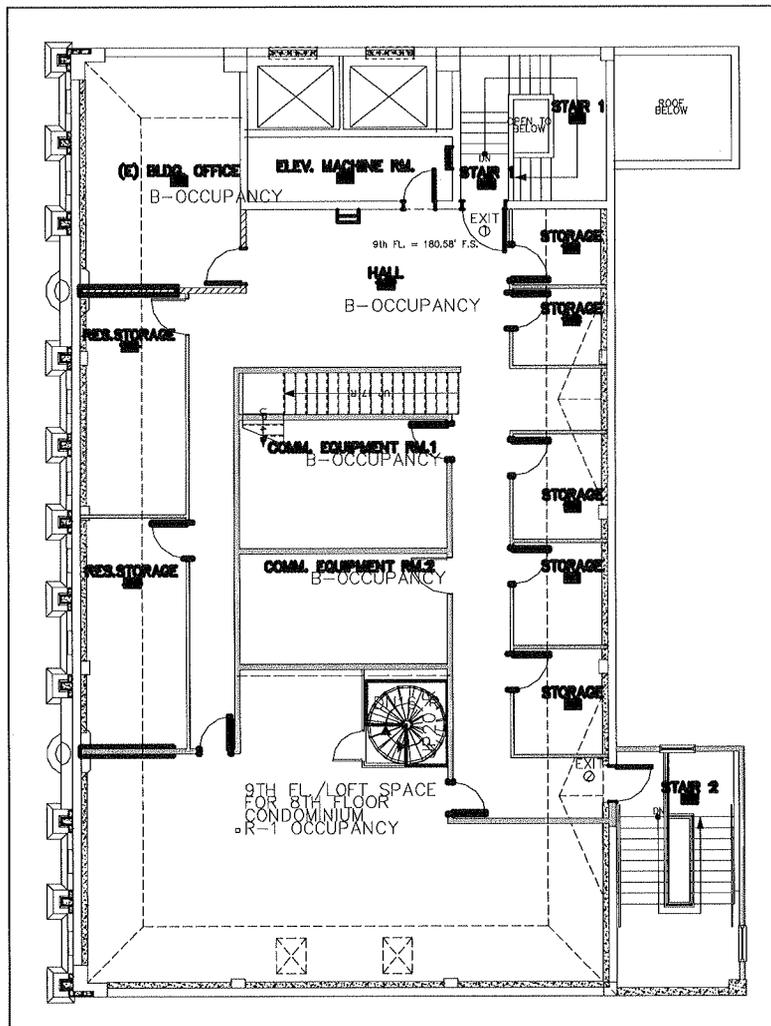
Ninth Floor Loft Proposed for Eighth Floor Residence
